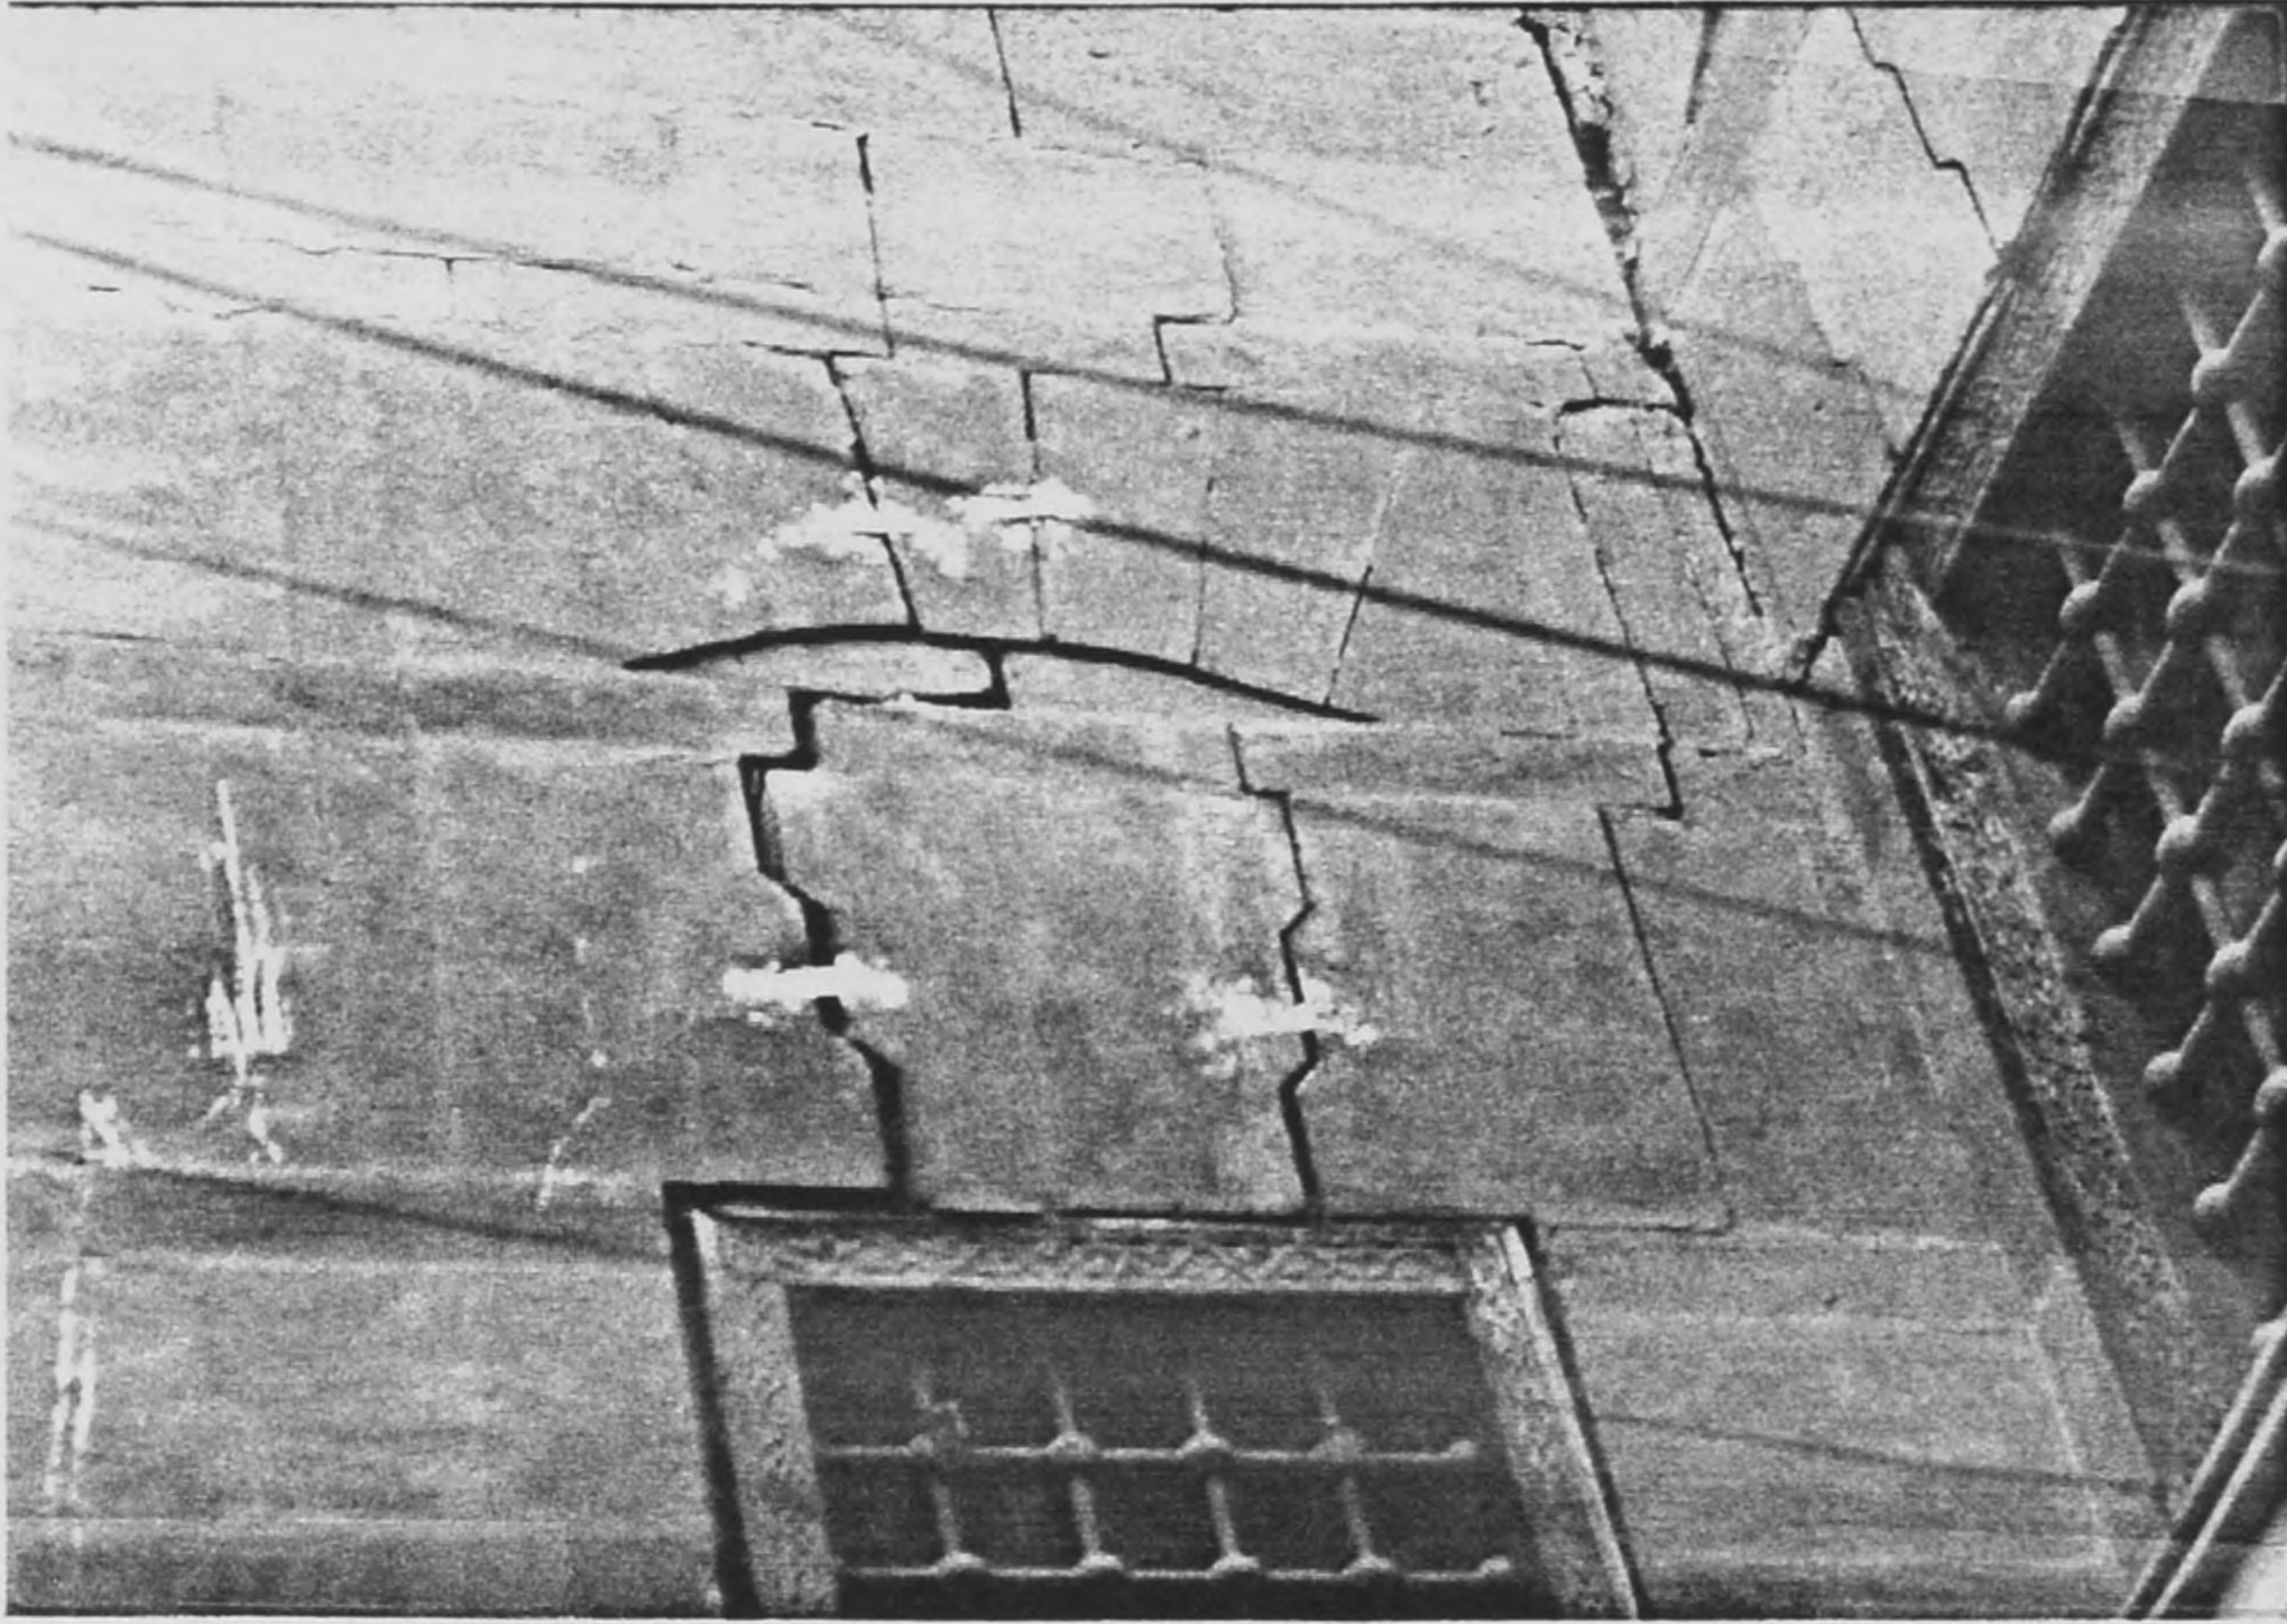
Plaster strips across cracks in west wall of mosque
